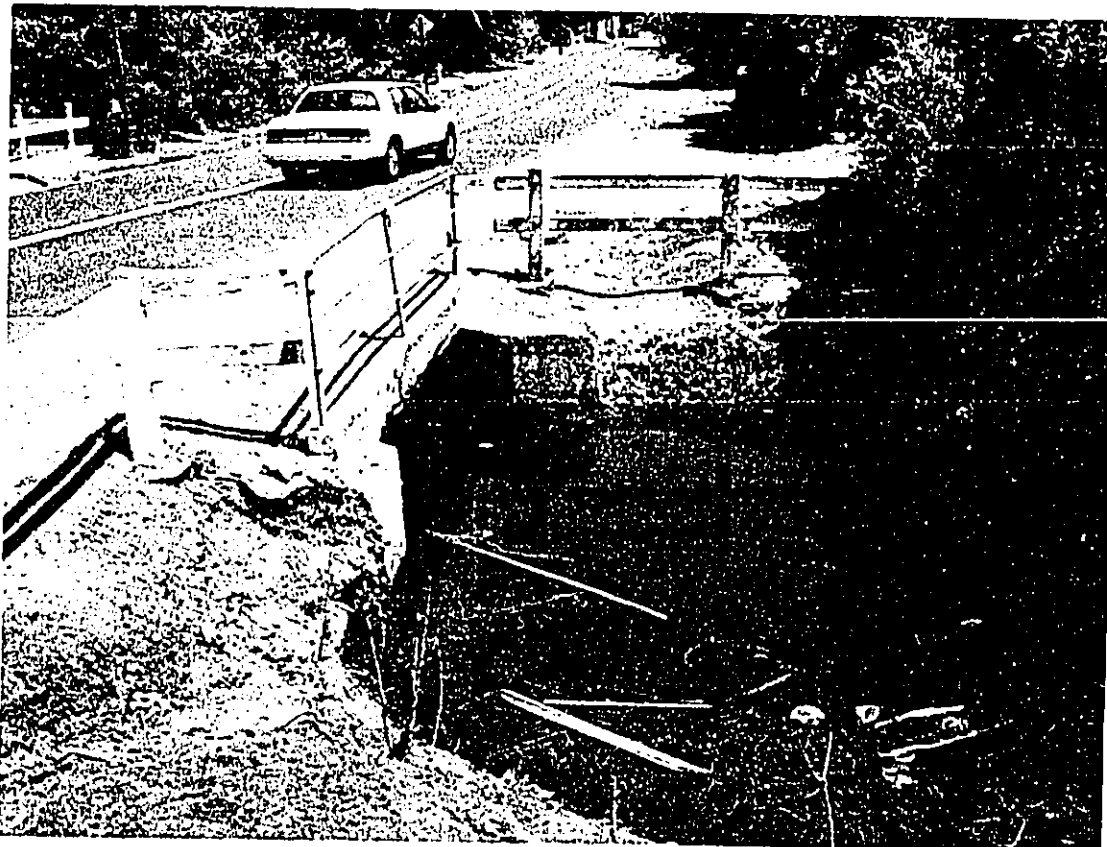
Looking east toward site of box culvert extension from south side of Waialua Beach Road.
